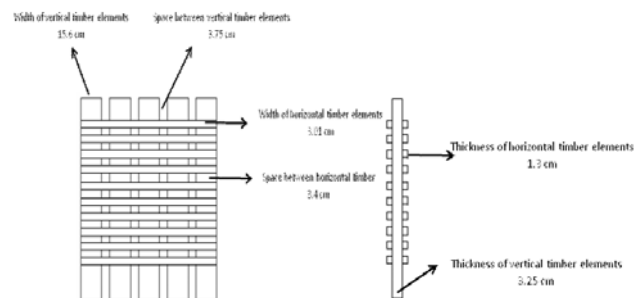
Detail for the timber structure of a typical exterior tabique wall
